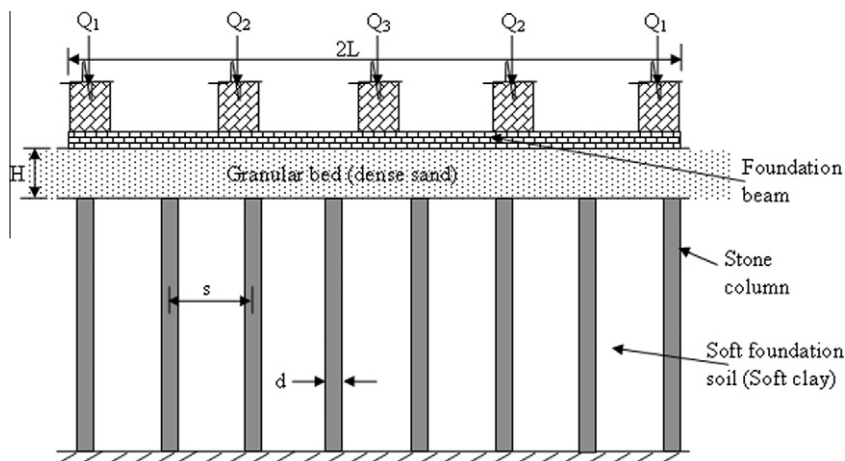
Footing–granular bed–stone column reinforced soft soil system.
